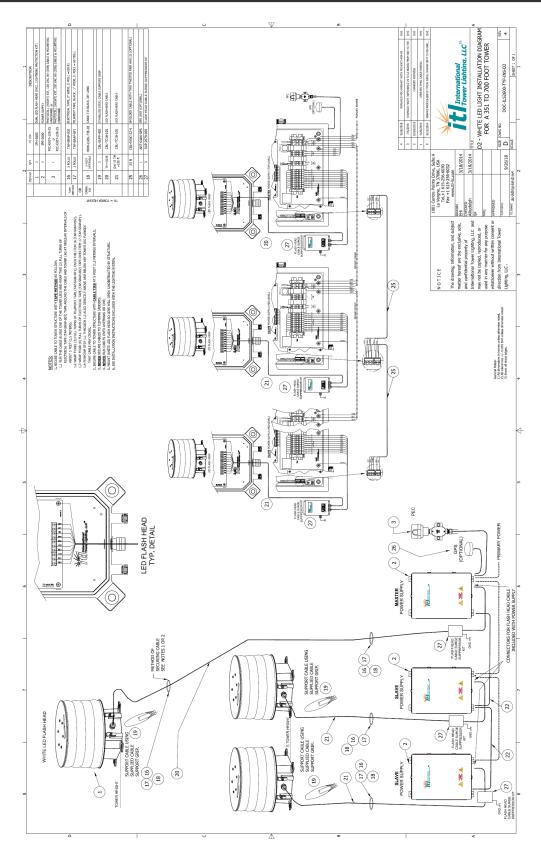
ILS-2600 Triple System Typical Installation Diagram – 700'
